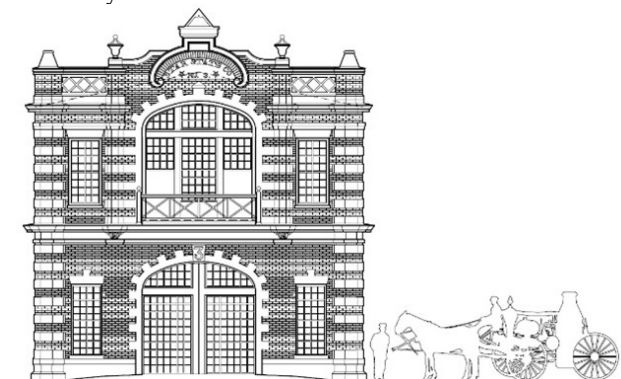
1900 Fire Station No. 3 reconstruction drawing.
